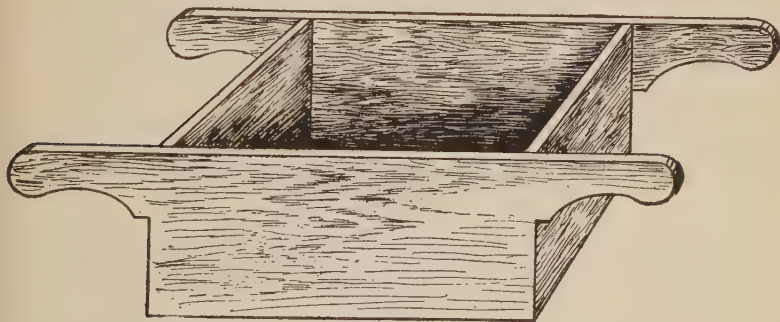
,896.—Box, or frame for measuring the materials in making concrete. *In size* the box should have a capacity of 1 cu. ft. It should have handles on the sides and no bottom as shown. The same materials are easily and accurately proportioned by means of this box. *In measuring*, place the box on the flat surface of the mixing platform, and fill with each material, level with the top as many times as called for by the formula. When filled it is easily lifted off by means of the handles at each corner, and no further tipping or moving is required.
